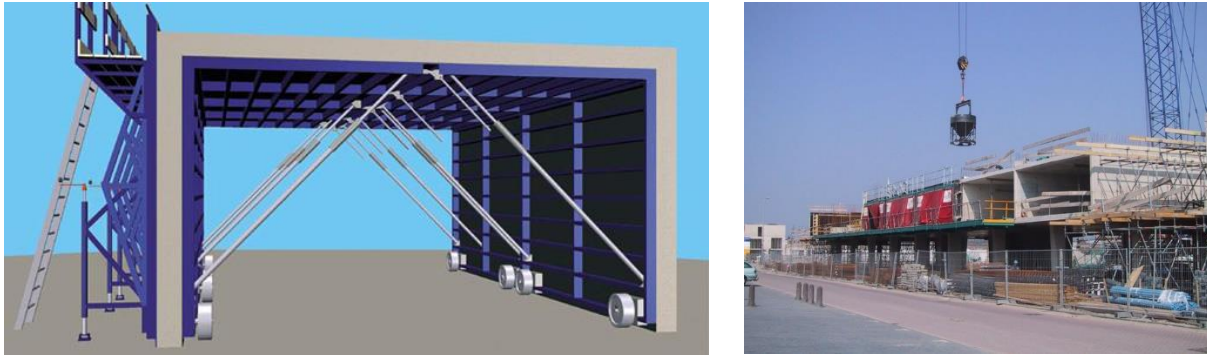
Tunnelgietsbouw construction (no columns or beams are present)
